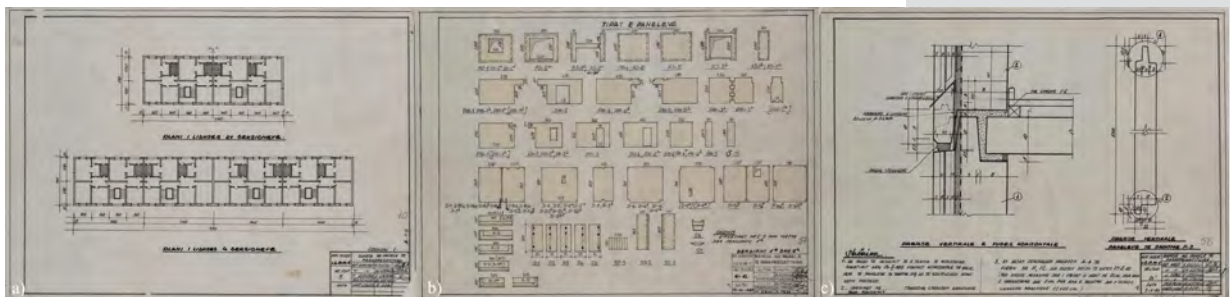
N°1 albanian type: a) plan scheme for a five storey building; b) construction elements; c) constructive details.
